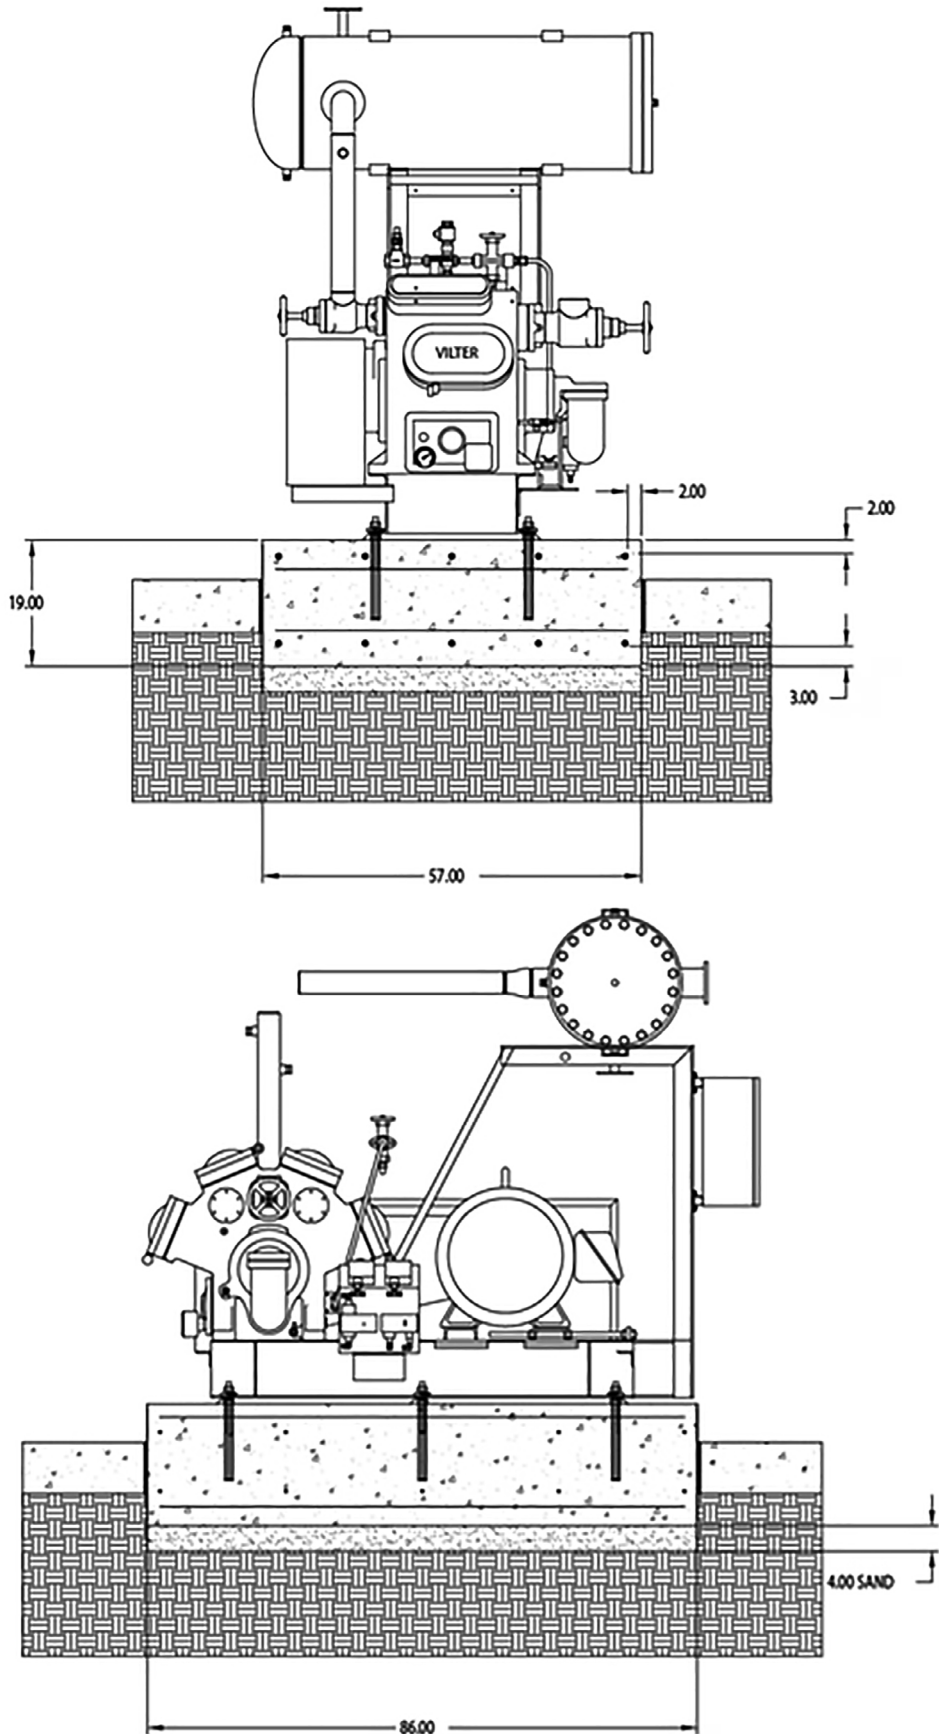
Compressor Unit and Foundation Dimensions – 6 and 8 Cylinder (3 of 6)
